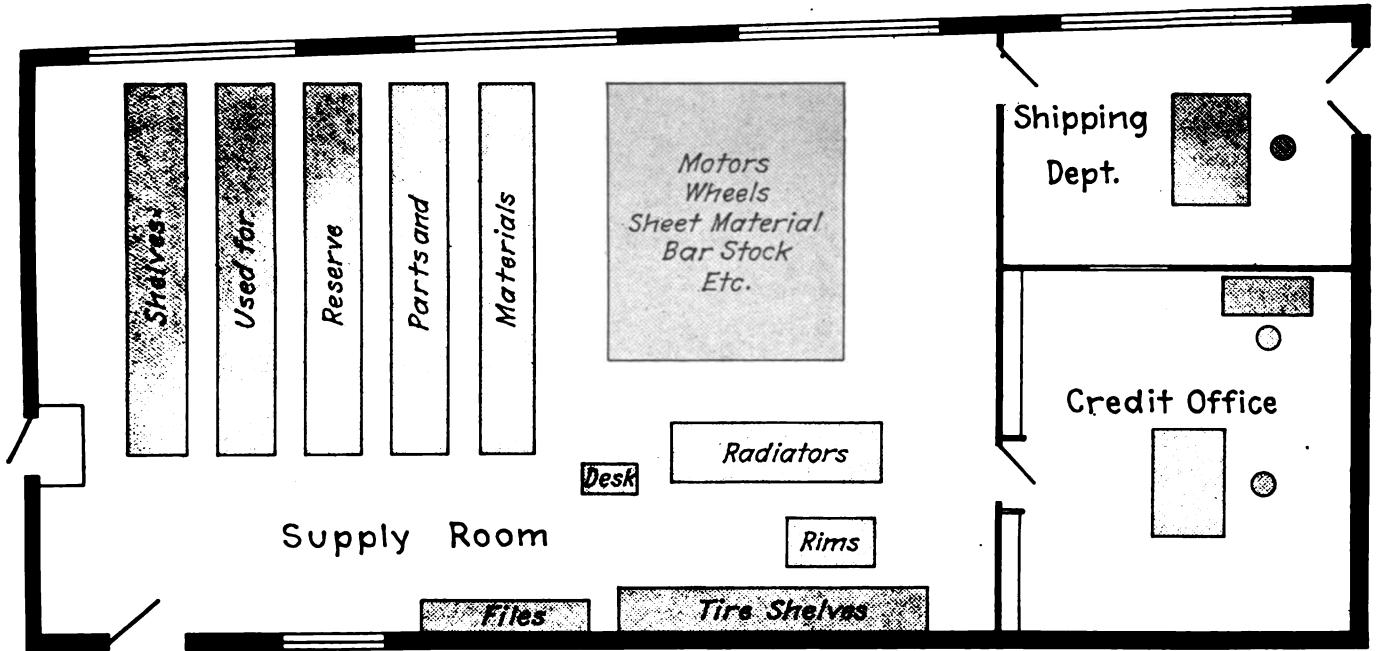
Floor plan of Alco stockroom, showing layout for storage of various parts
